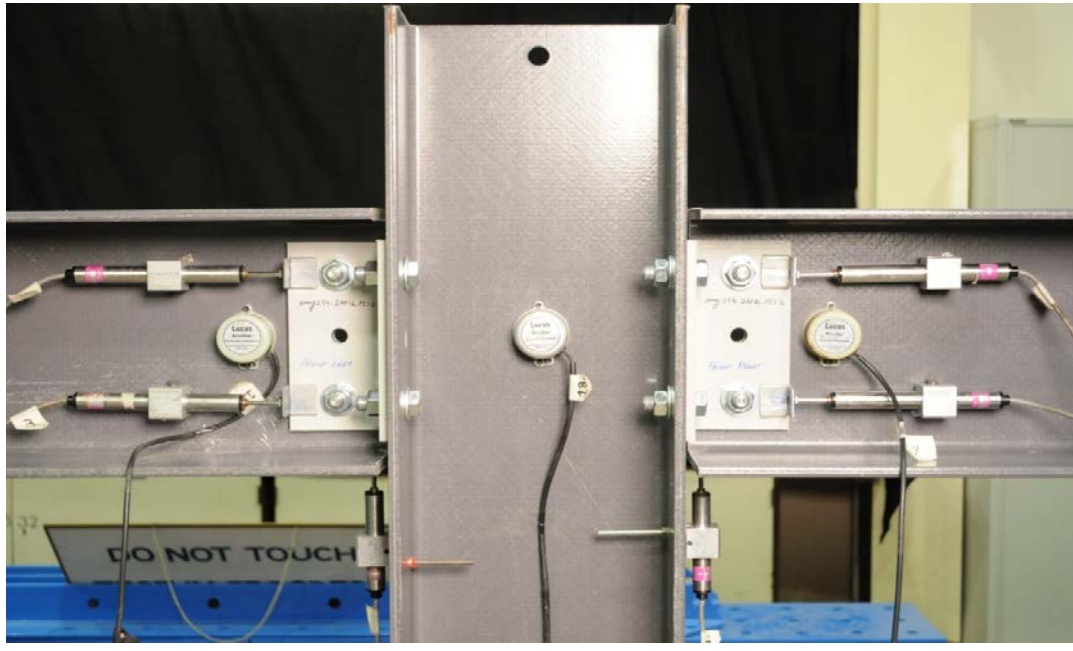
Details of nominally pinned beam-to-column joint test Wmj254\_2M16\_FC1-2.
